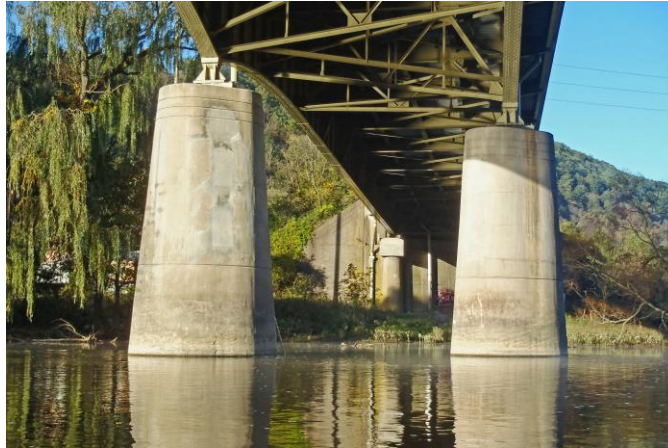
Photo. Example of RC column bent. (Source FHWA).
